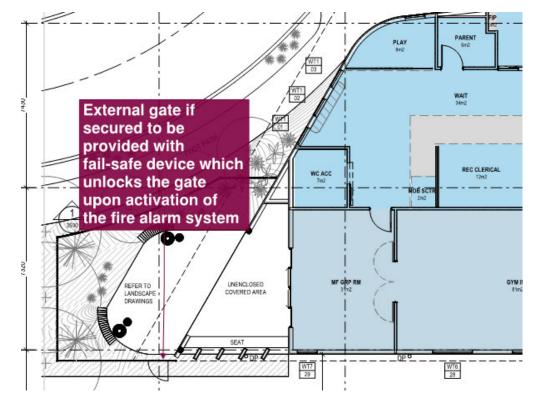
Gate provided from the courtyard area on the Western Elevation of the building
